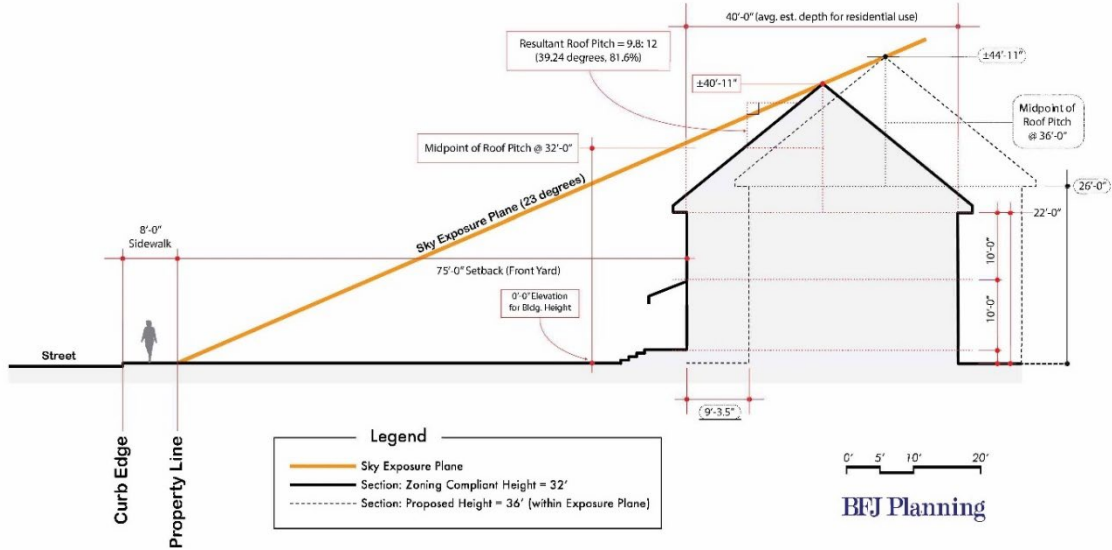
AA-1 District Sky Exposure Plan Analysis- Elevation Decline
